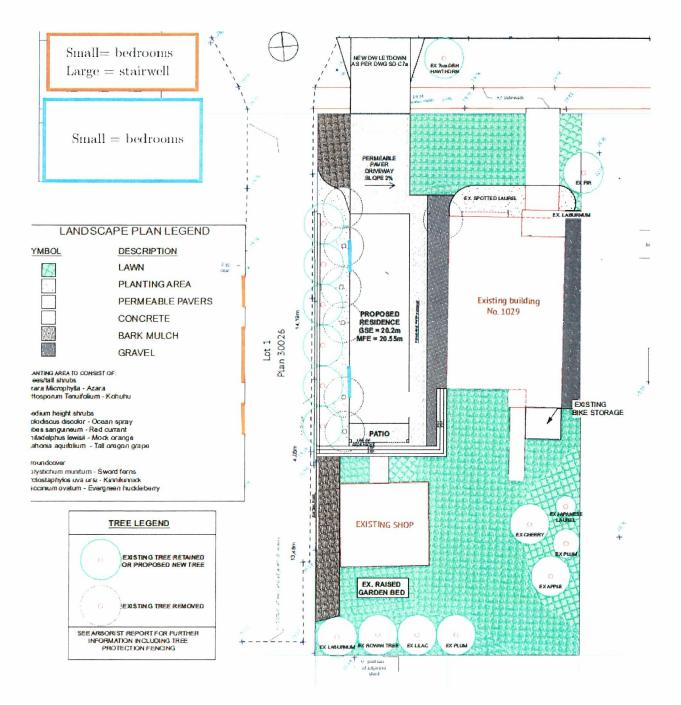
WINDOW RELATIONSHIP BETWEEN APARTMENT BUILDING AND CARRIAGE HOUSE
